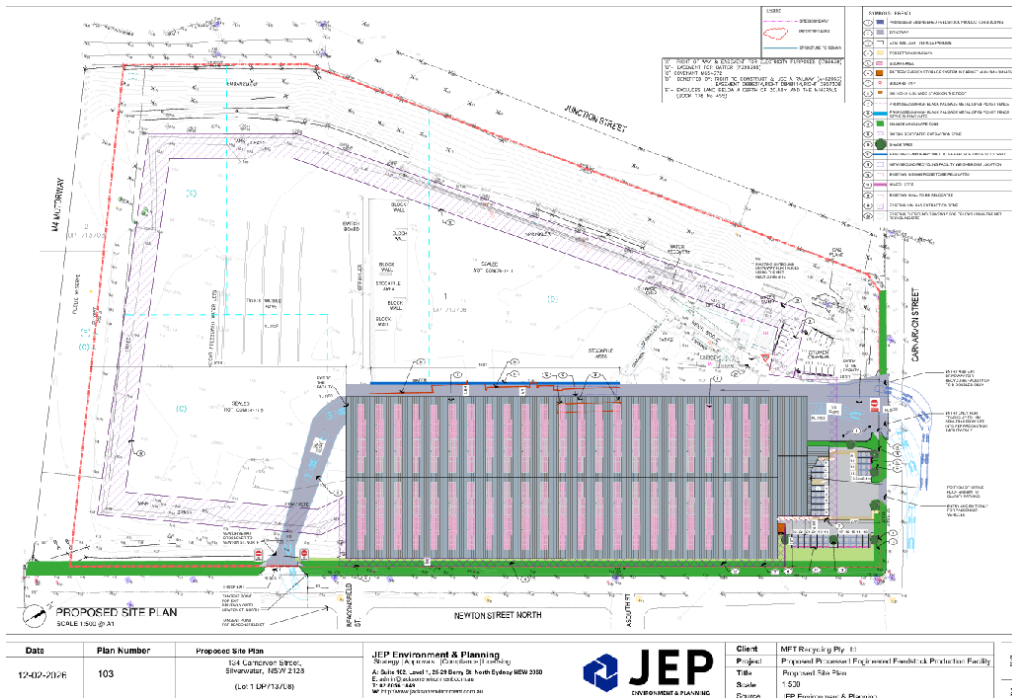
Proposed Site Layout (Source: JEP Environment & Planning, dated 12 February 2026)
